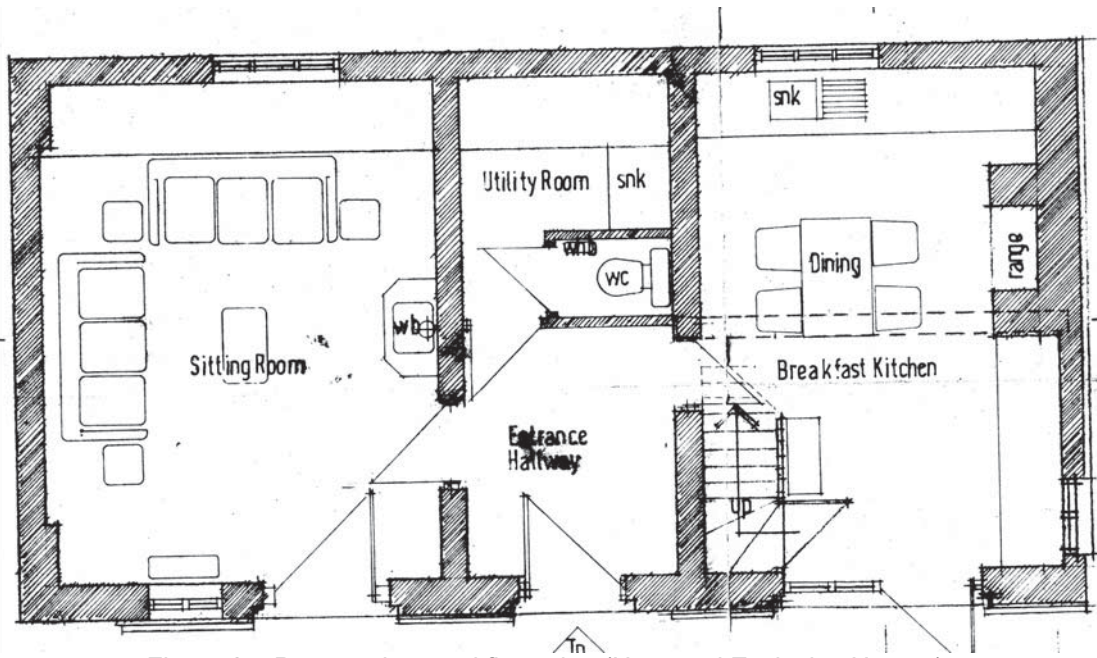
Proposed ground floor plan (Haywood Exclusive Homes).
